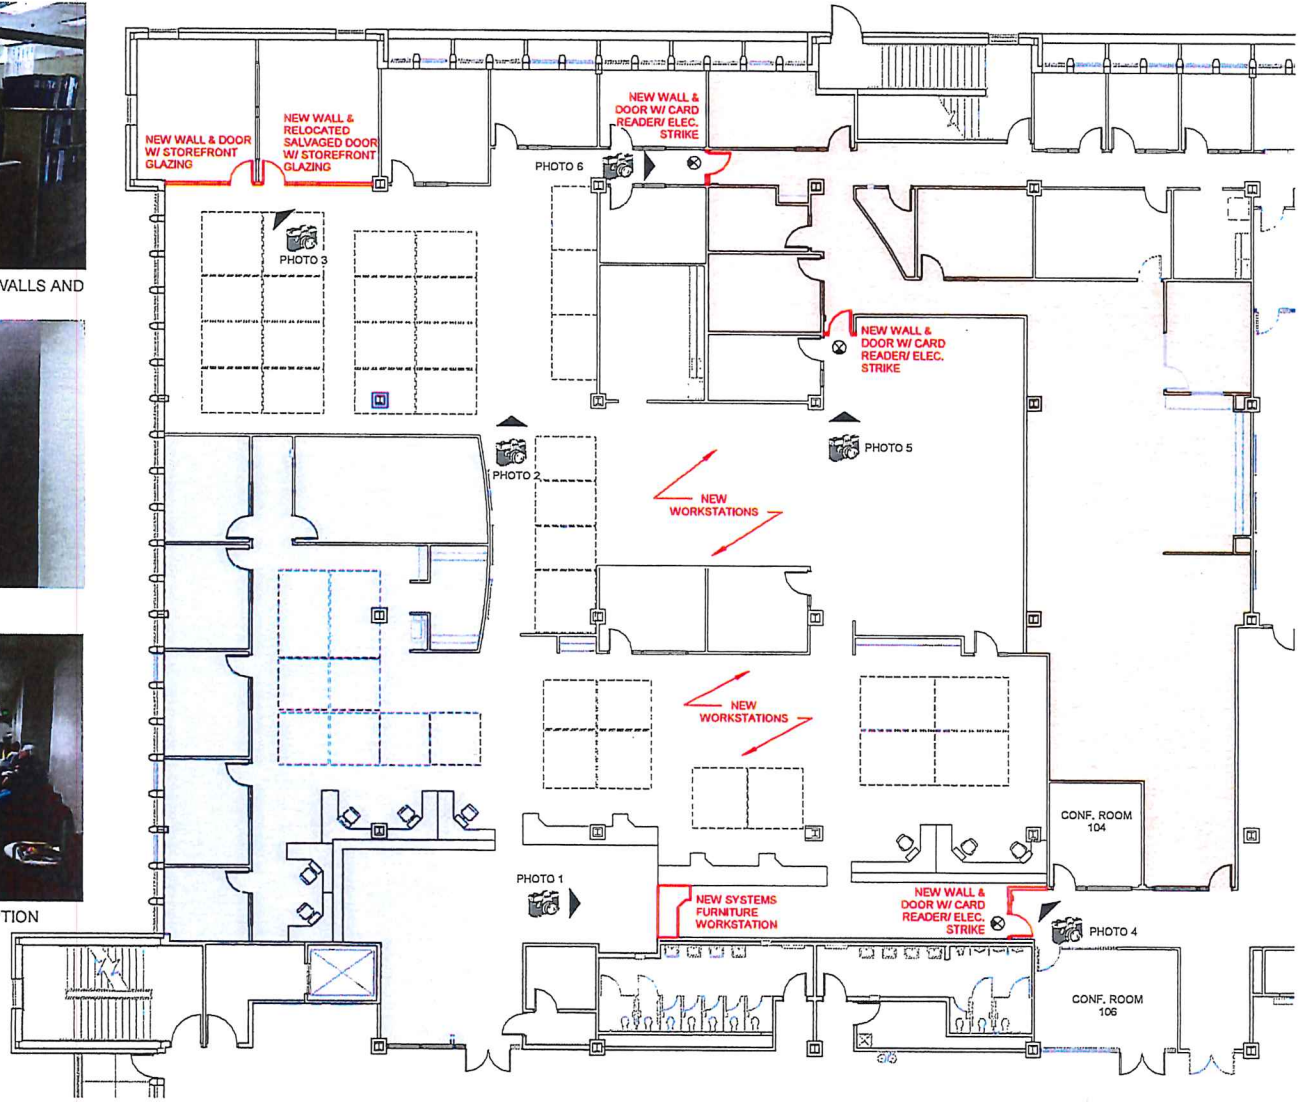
LOCATION FOR NEW WALLS AND DOOR FRAMES
